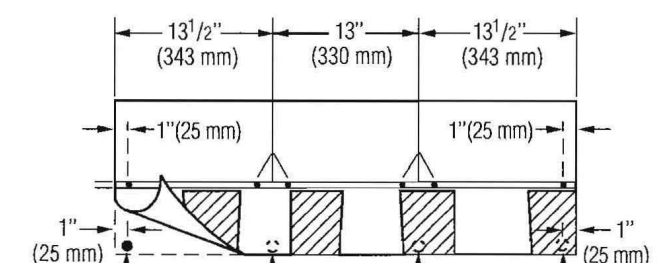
Use six nails and four spots of asphalt roofing cement on steep slopes.
